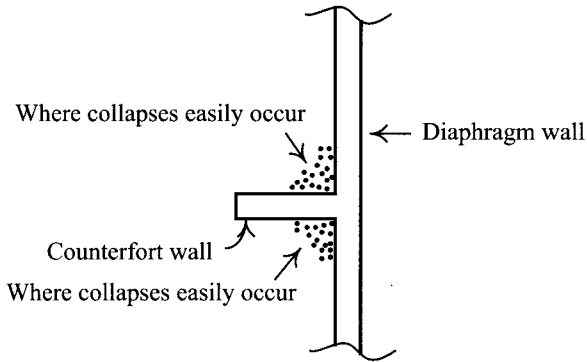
Corners where a counterfort wall, connecting to diaphragm walls, easily collapses.
